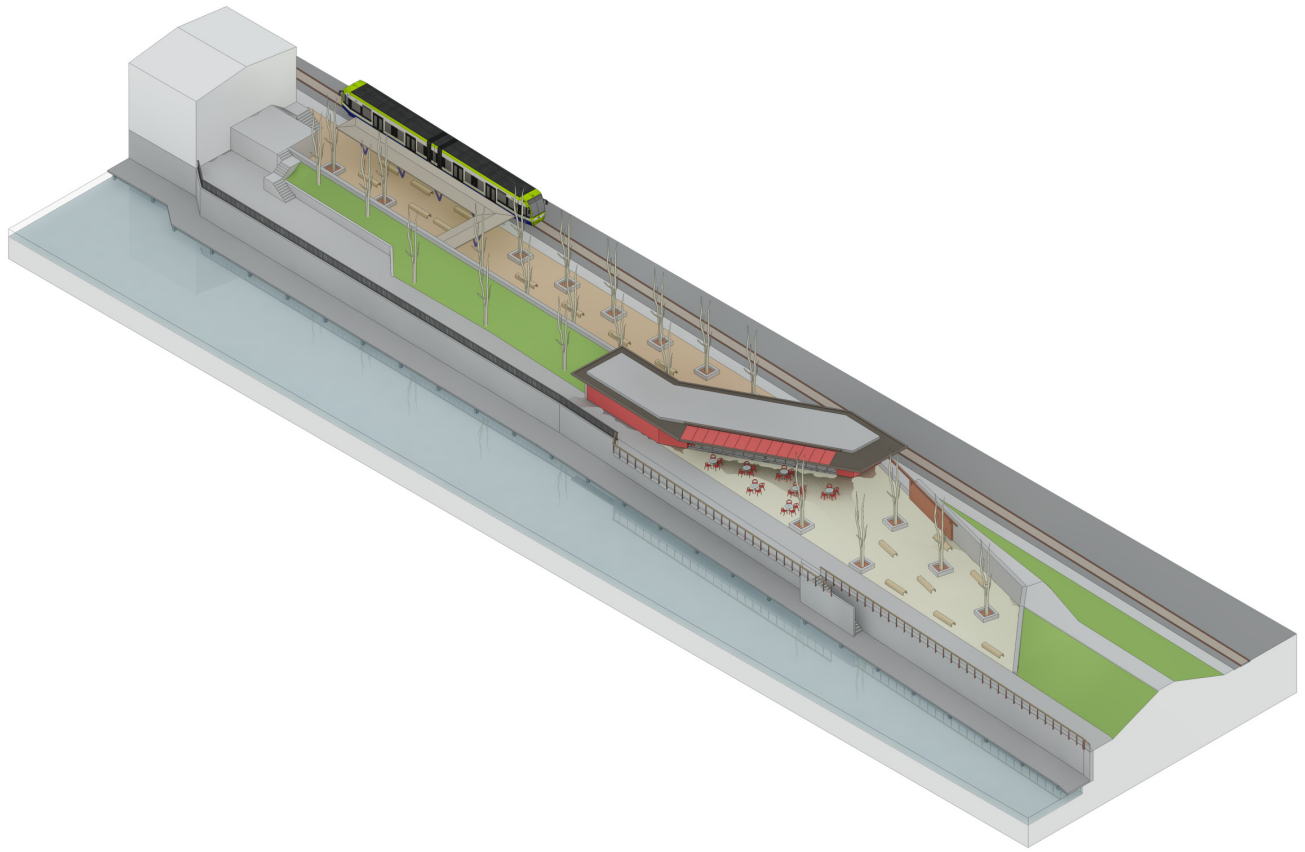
Axonometric view of the Promenade Cafe, showing a new pedestrian canopy for a future LRT stop, a cafe structure, new retaining wall with sliding steel wall, and the public plaza it encloses. This view also shows the cantilever of promenade north of a new concrete stair that connects to the continuous riverside path.
